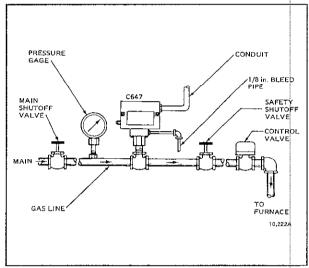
TYPICAL INSTALLATION OF THE C647A GAS PRESSURE SWITCH.
